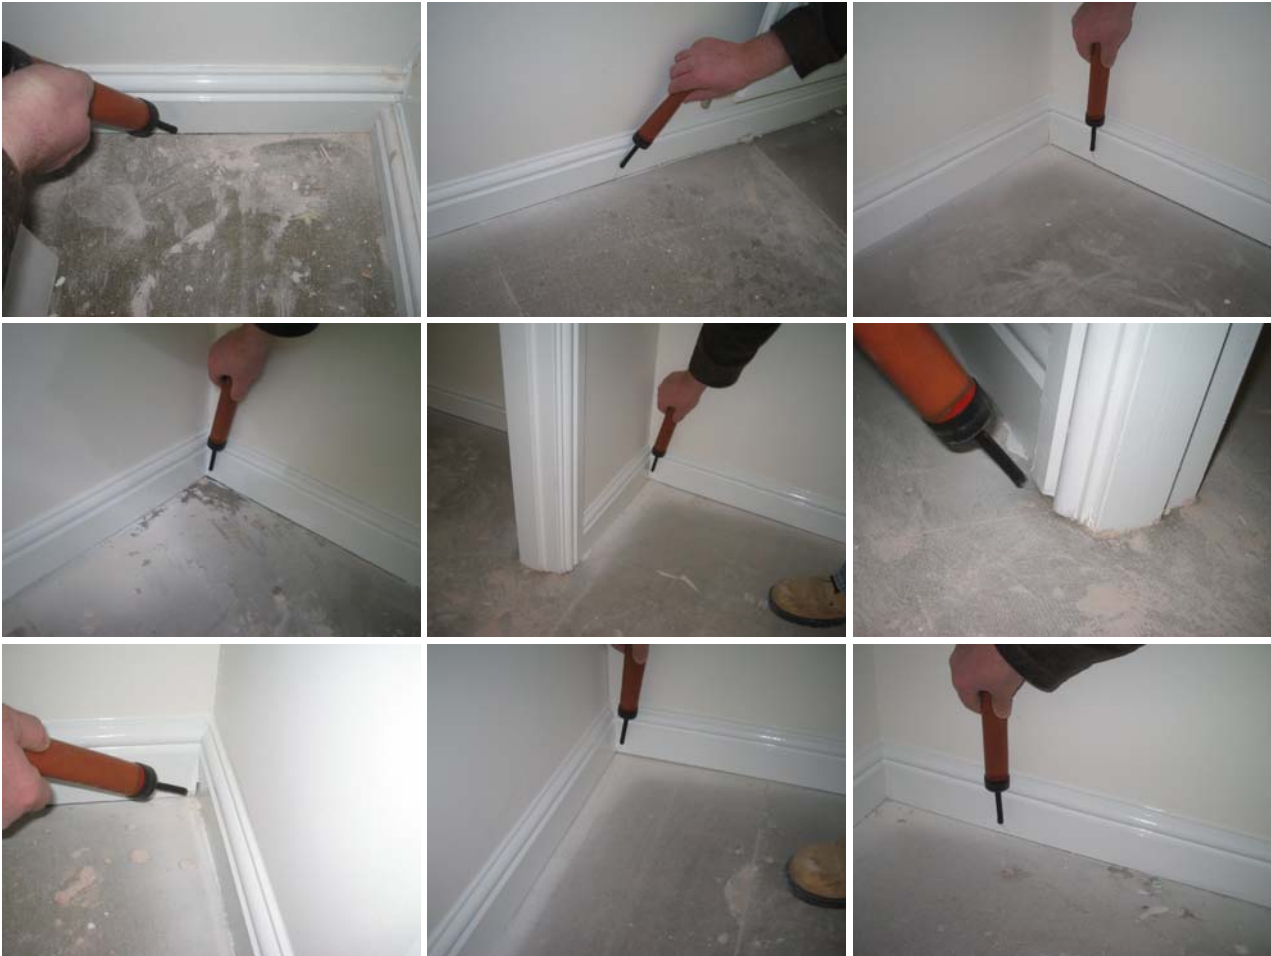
Air movement around the second floor perimeter, in the bathroom and both bedrooms, on internal, external and separating walls.
